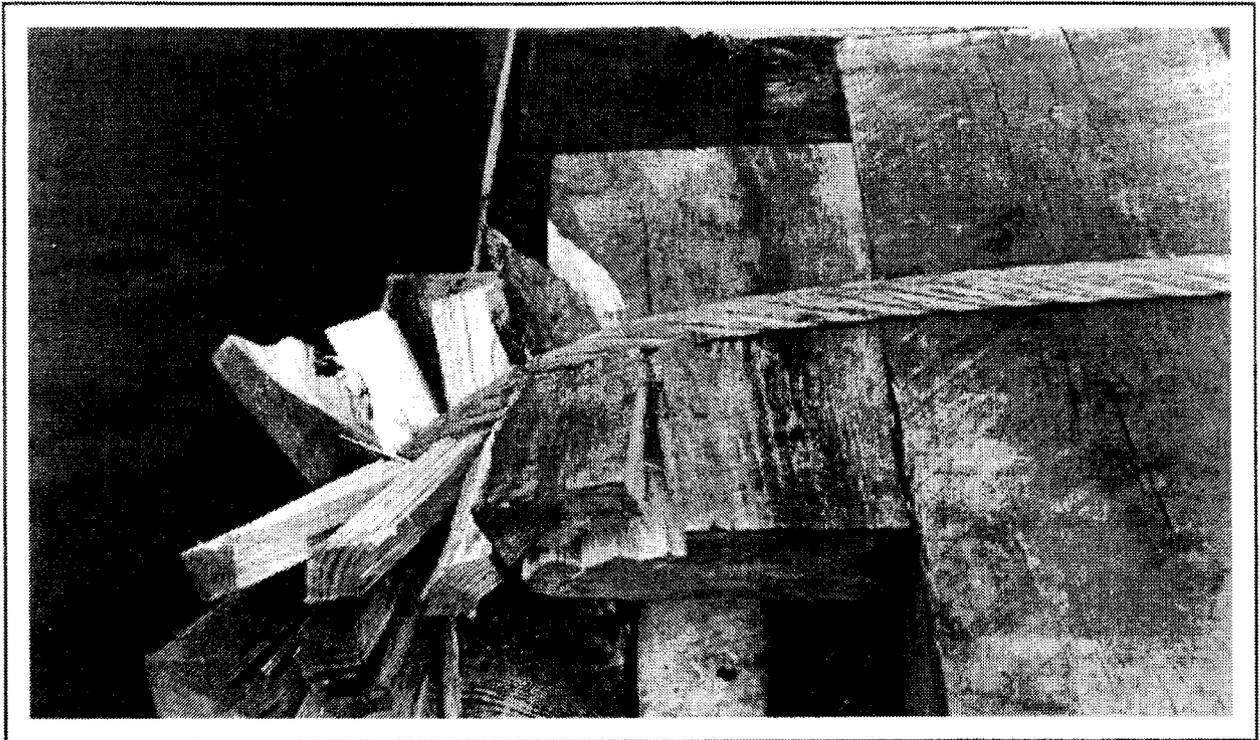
Barge Deck Edges Showing Structural Reinforcement.
